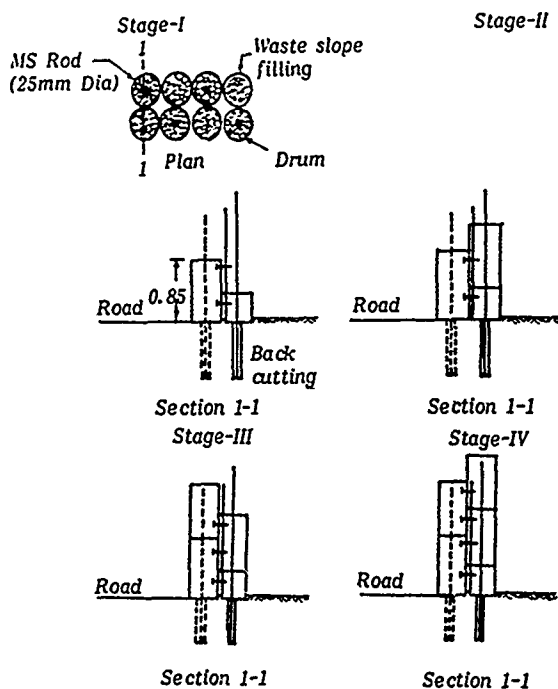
SEQUENCE OF CONSTRUCTION OF ANCHORED DRUM DIAPHRAGM WALL
